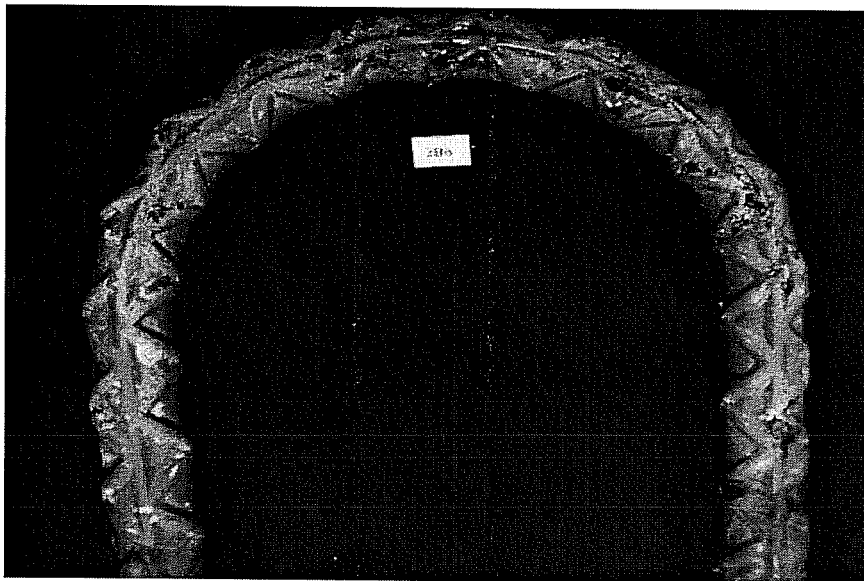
Pitting Damage on Epoxy-coated Bent Bar (3B9).
